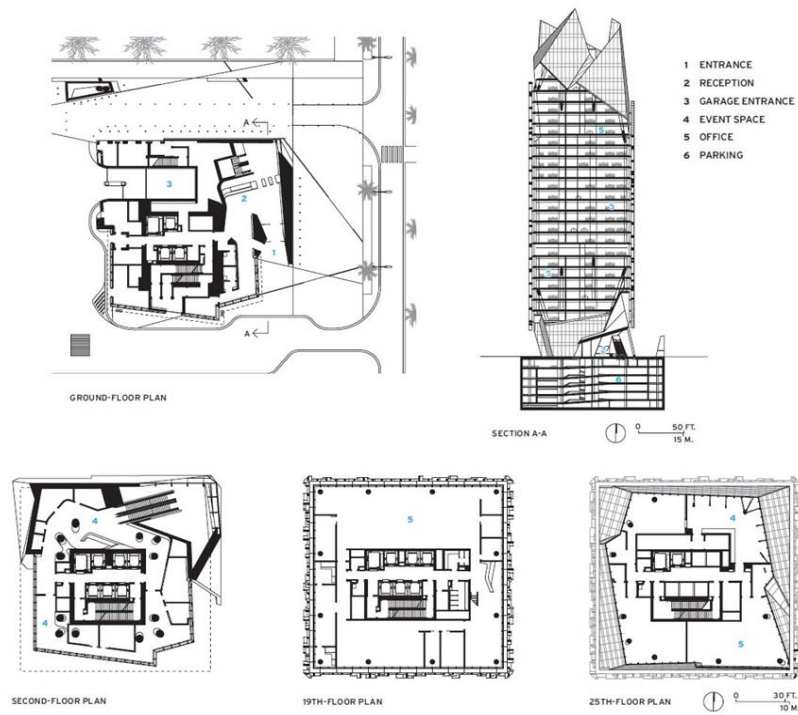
Plan, section of the Casablanca Finance City Tower
